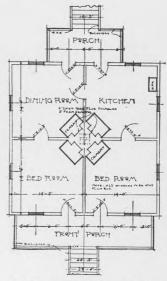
FLOOR PLAN OF TYPI-CAL 4-ROOM HOUSE.
